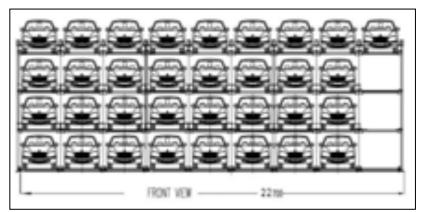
Typical Layout of Multi-level Puzzle Car parking
